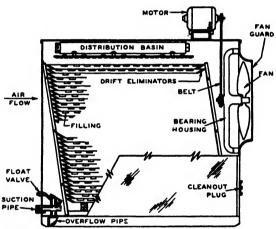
Small Horizontal Induced Draft Cooling Tower for 3 to 50-ton Refrigerating Units
